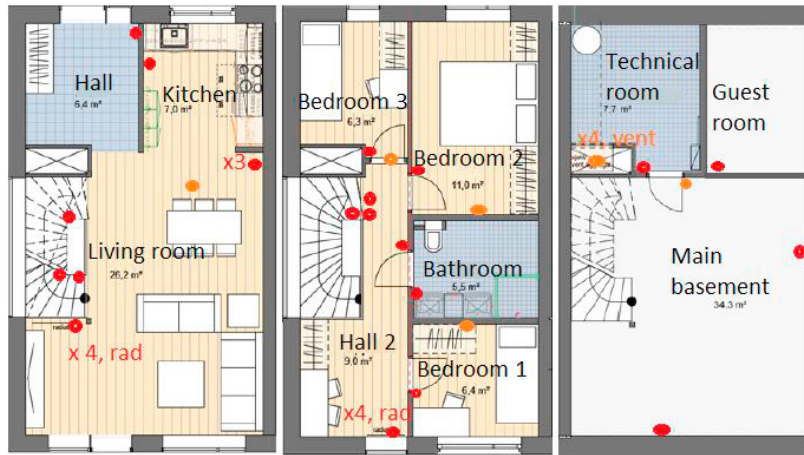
Floor plan of House 1 for the ground floor (left), first floor (center) and basement (right), with north points upwards.
